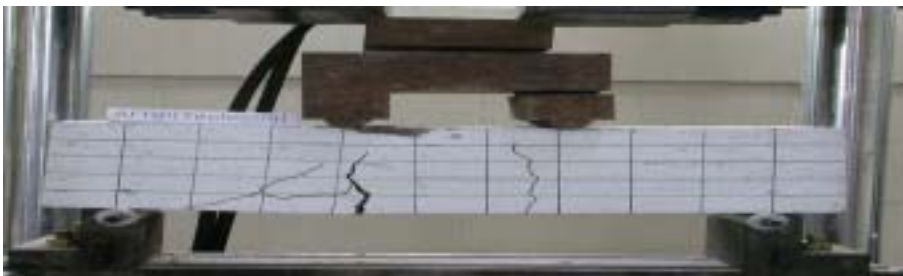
Photo of flexure and shear cracks from CFRP ISO rebar reinforced concrete specimens
